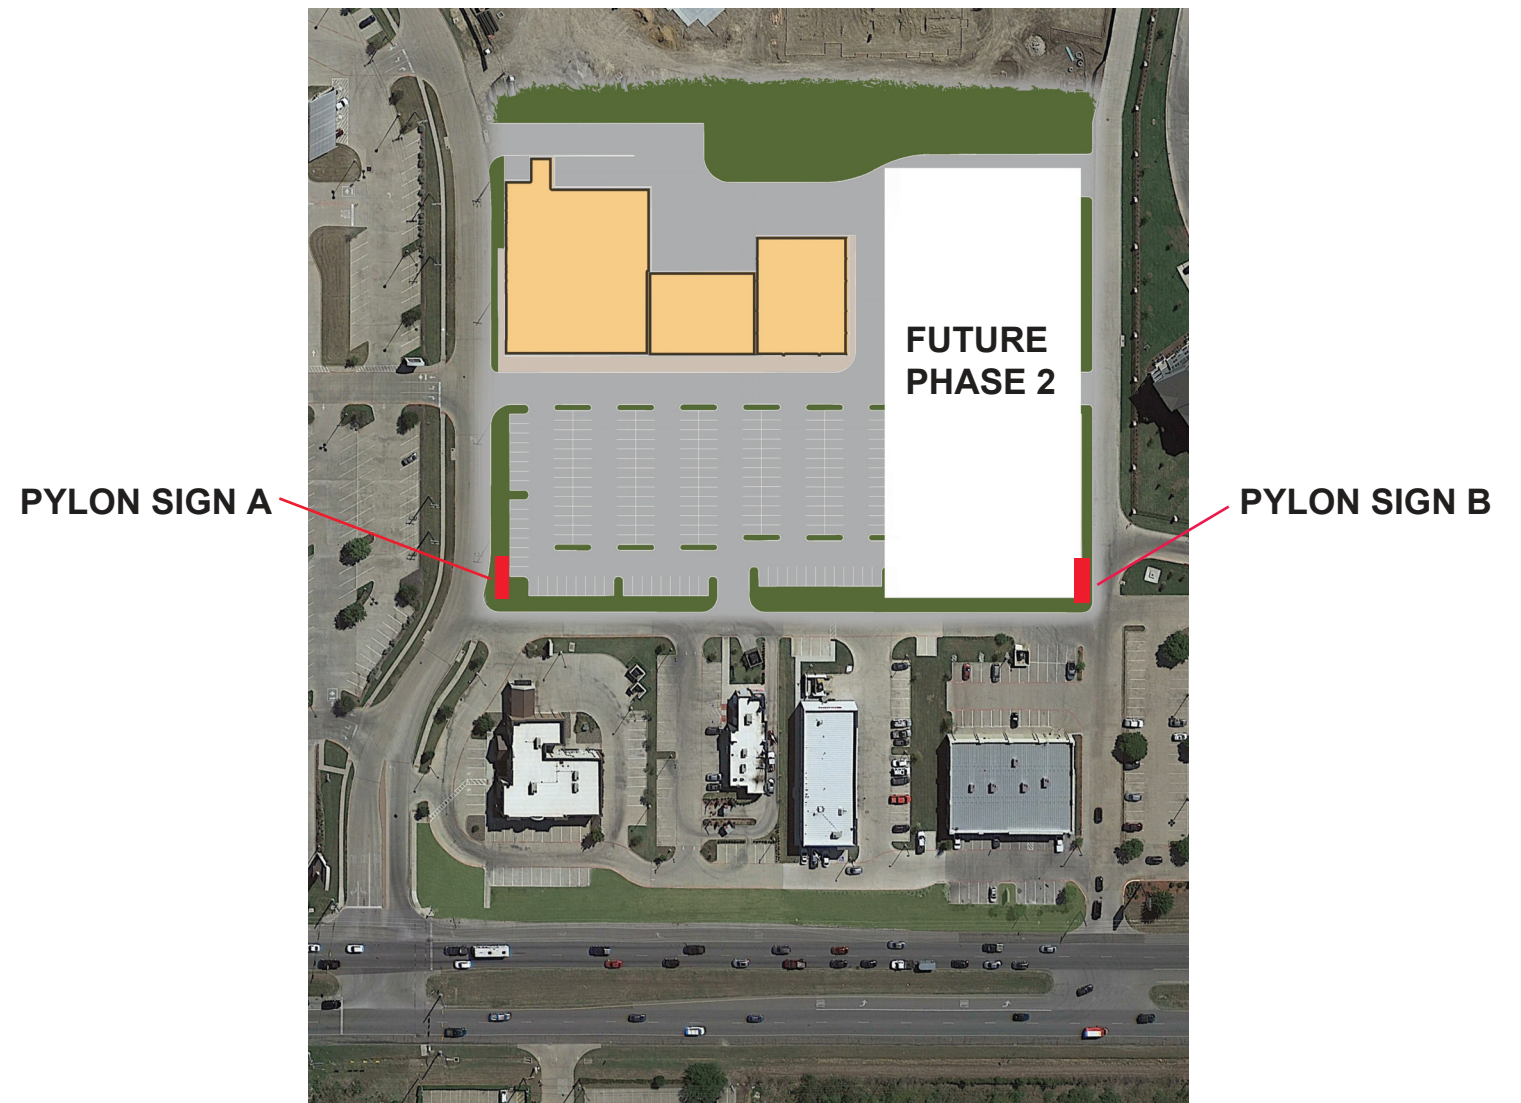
EXHIBIT A - CONCEPTUAL PLAN AND PYLON SIGN RENDERINGS
